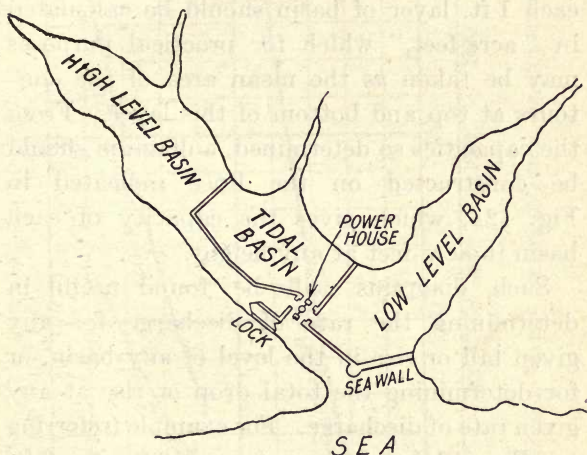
PLAN OF BASINS FOR CONTINUOUS WORKING,
